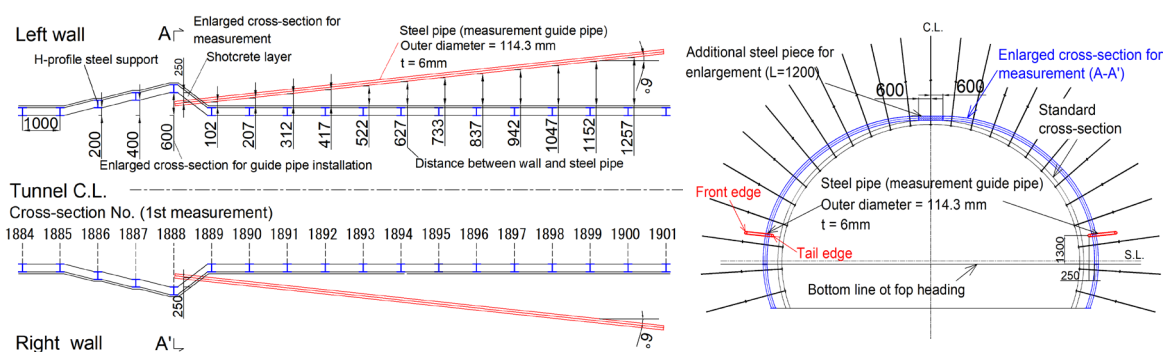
Plan and cross-sectional view of steel pipes for pre-displacement measurement (at 1st installation).
